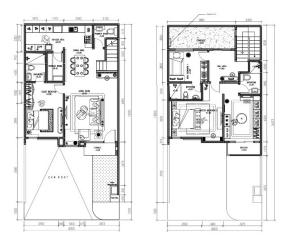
layout Furniture 1st and 2nd floor residential Green Lake City Cluster East Asia (Source: Jihan, 2021)
